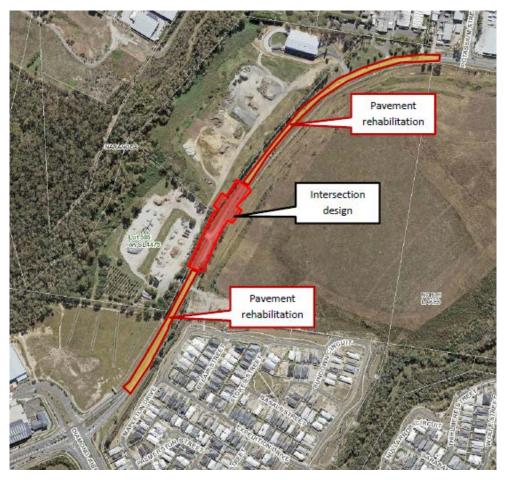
Boundary Road - intersection and road pavement rehabilitation - separable portion 1
